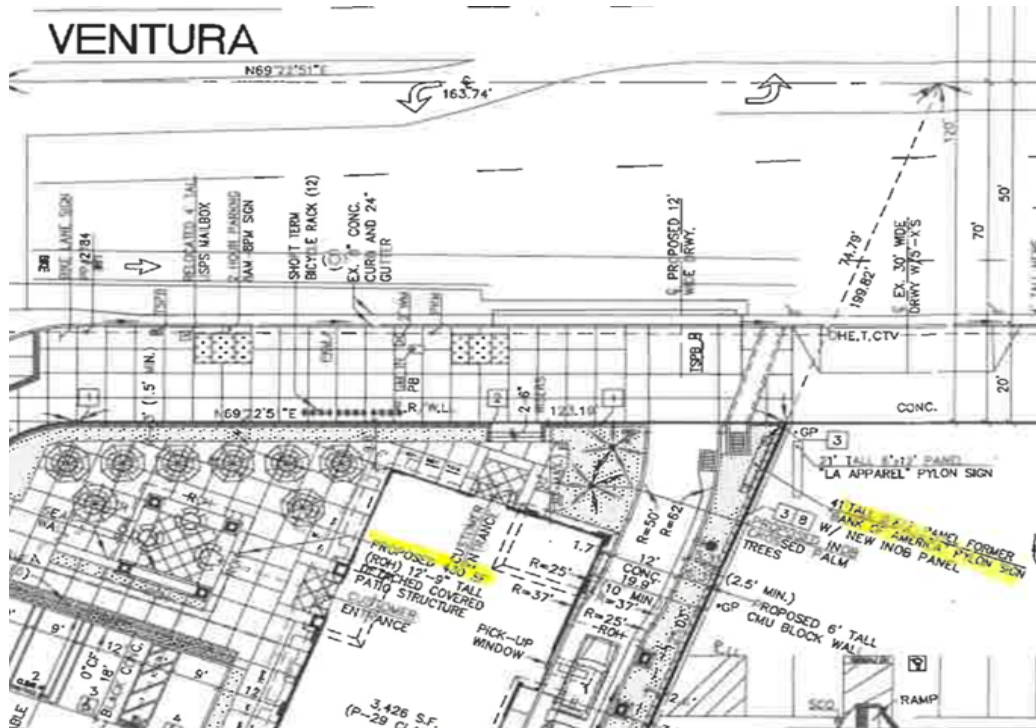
EXCERPT OF PROJECT SITE PLAN SHOWING LOCATION OF 6-FOOT-TALL WALL AND SIGNAGE
